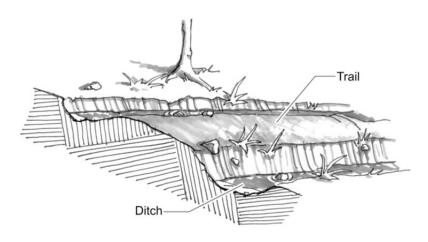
Slot Trench Drains and Elevated Trail Tread
